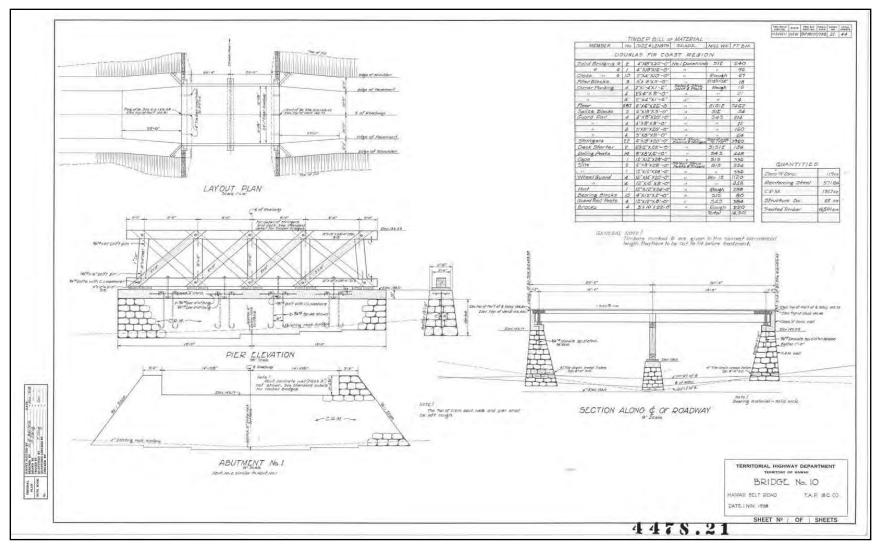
1938 Territory of Hawaii, Territorial Highway Department, Bridge No. 10 (Hīlea Bridge) plans
